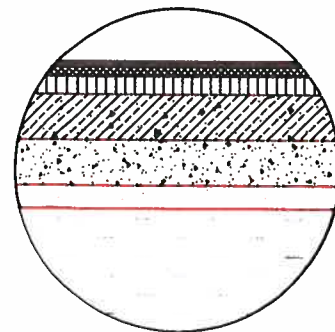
Detail A - STUDIED ROAD STRUCTURES / Detaliu A - STRUCTURI RUTIERE STUDIATE
